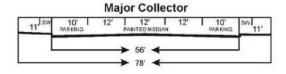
CITY OF PERRIS GENERAL PLAN ROADWAY CROSS-SECTIONS
